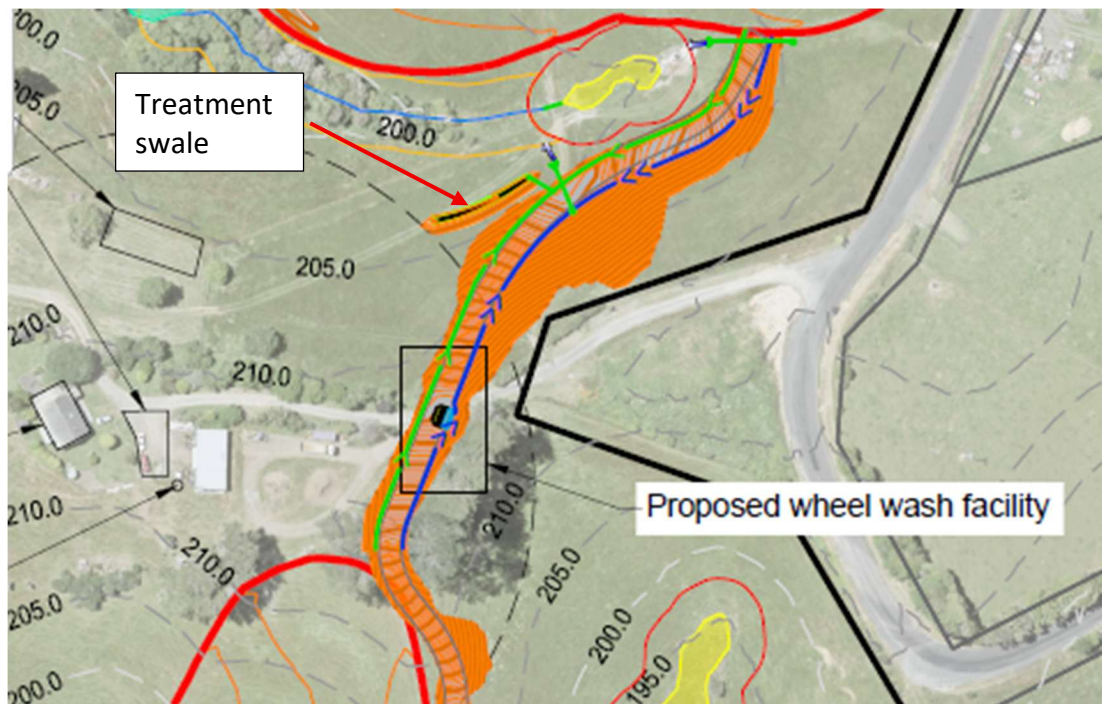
Haul Road Stormwater Swale and Wheel wash facility (from FTL drawing 33250/190)
